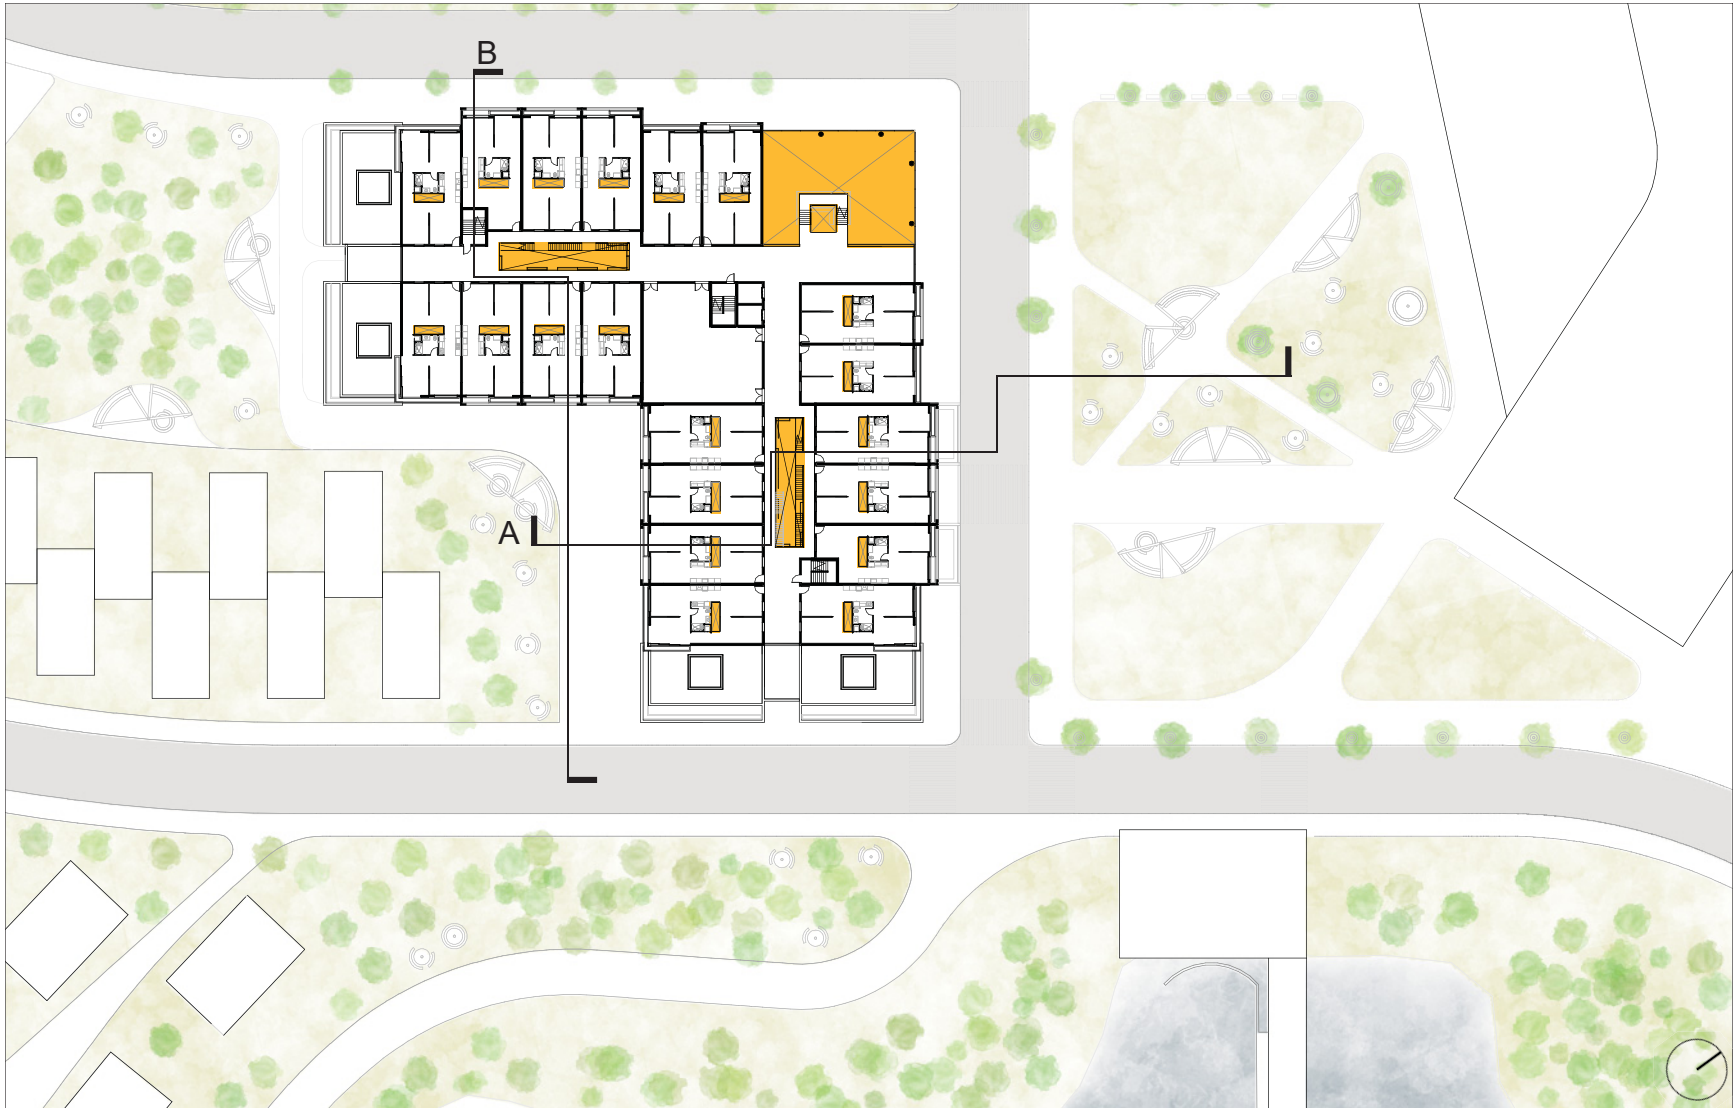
Block housing typology site plan, with level 4 floor plan, showing the building's relationship to its surroundings.
